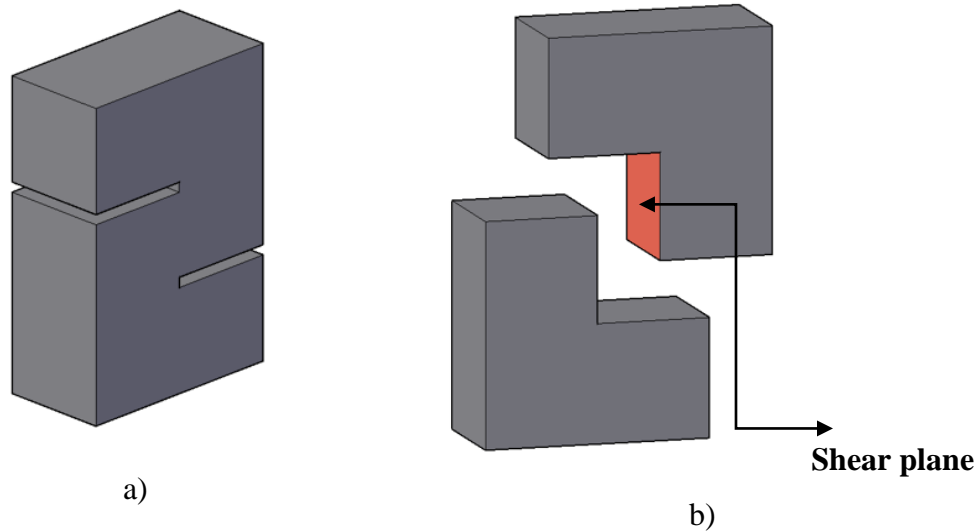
A 3-D illustration for the push-off model, a) general view, and b) a view showing the shear plane of the specimen
